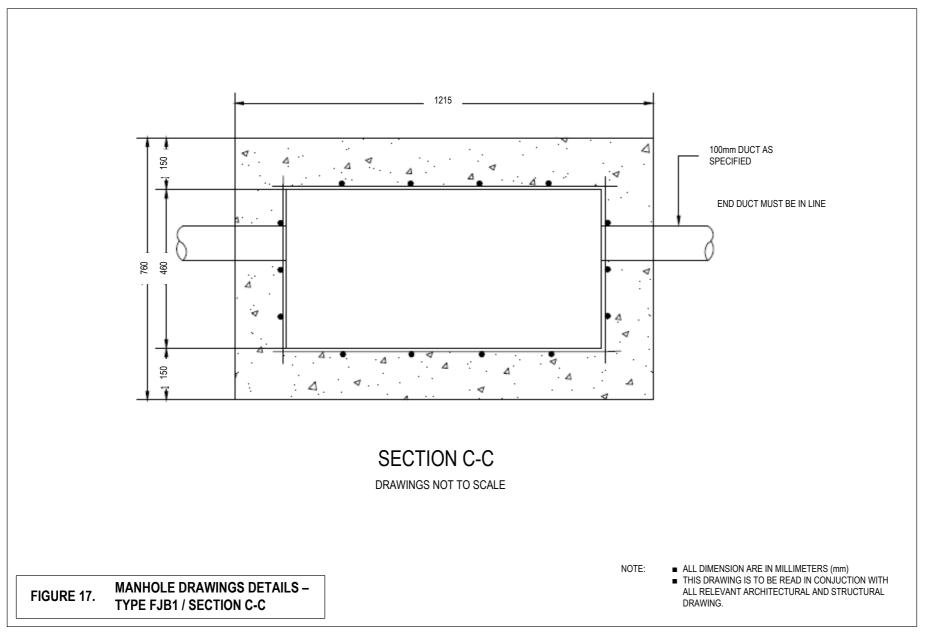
Manhole drawings details – Type FJB1 / section C-C
